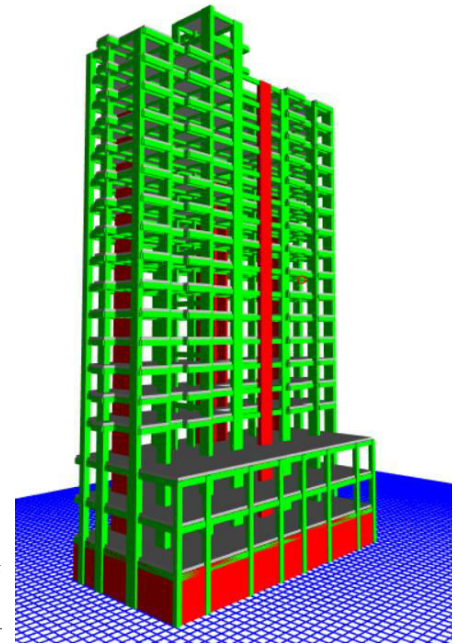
;Elevation Views Creation of G+20 Multi-Storey Building with Basement, 3 podium Floor and 14 storey (Including future expansion).
